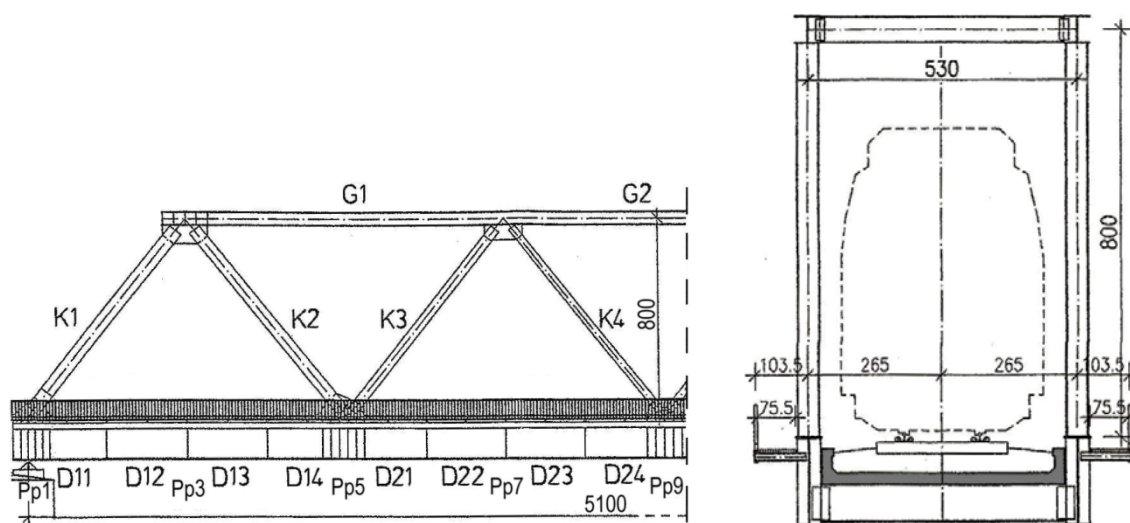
Analyzed bridge span: general view (left) and cross-section (right)
